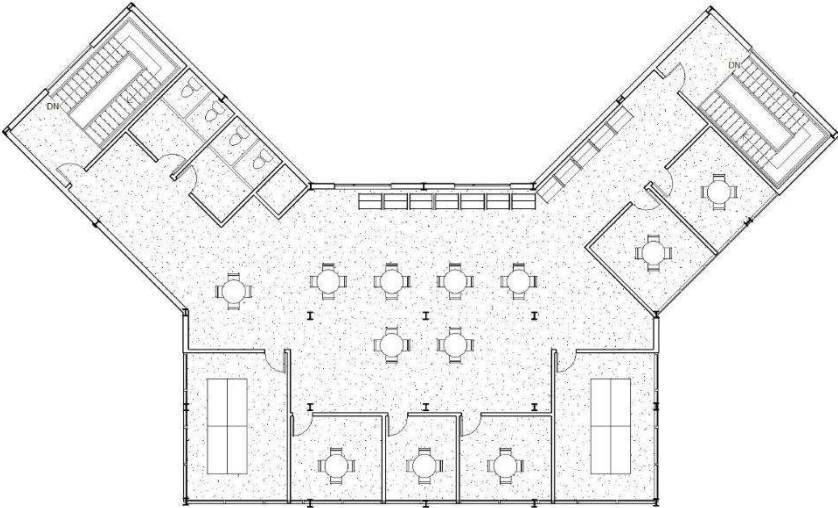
3<sup>rd</sup> Floor Floor Plan
